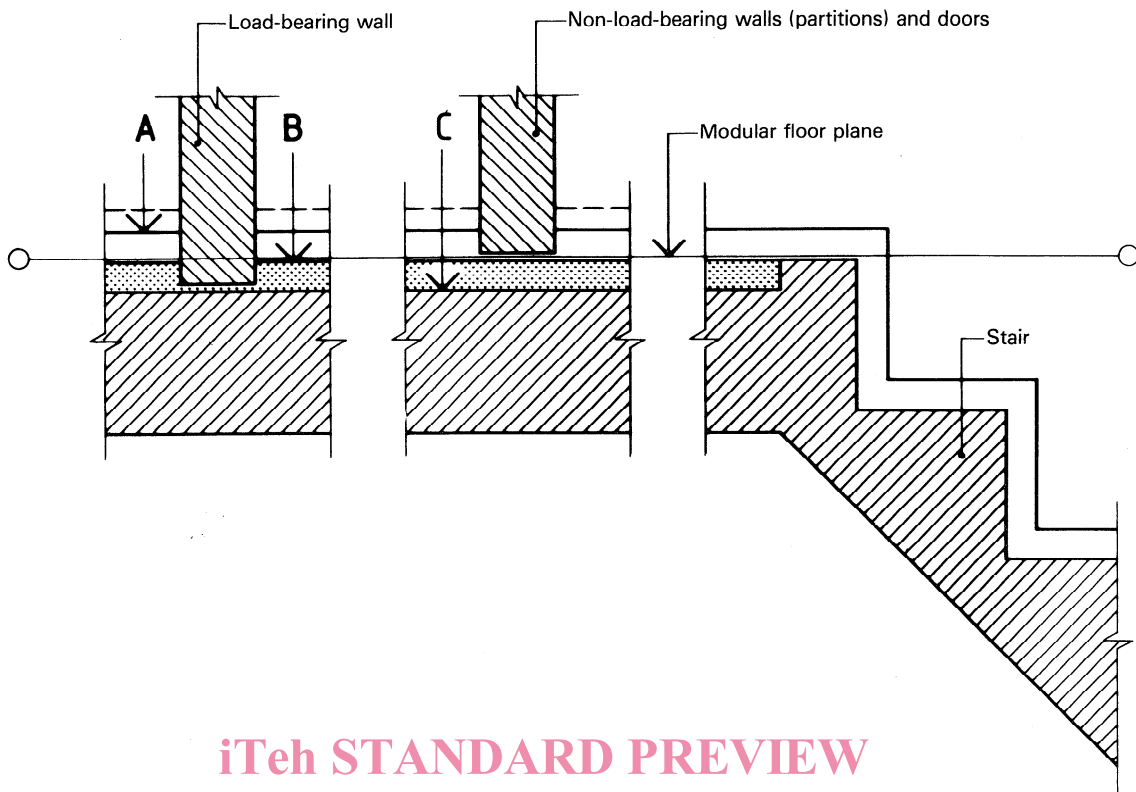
a) – Modular floor plane coinciding with upper surface of floor covering (level A)
